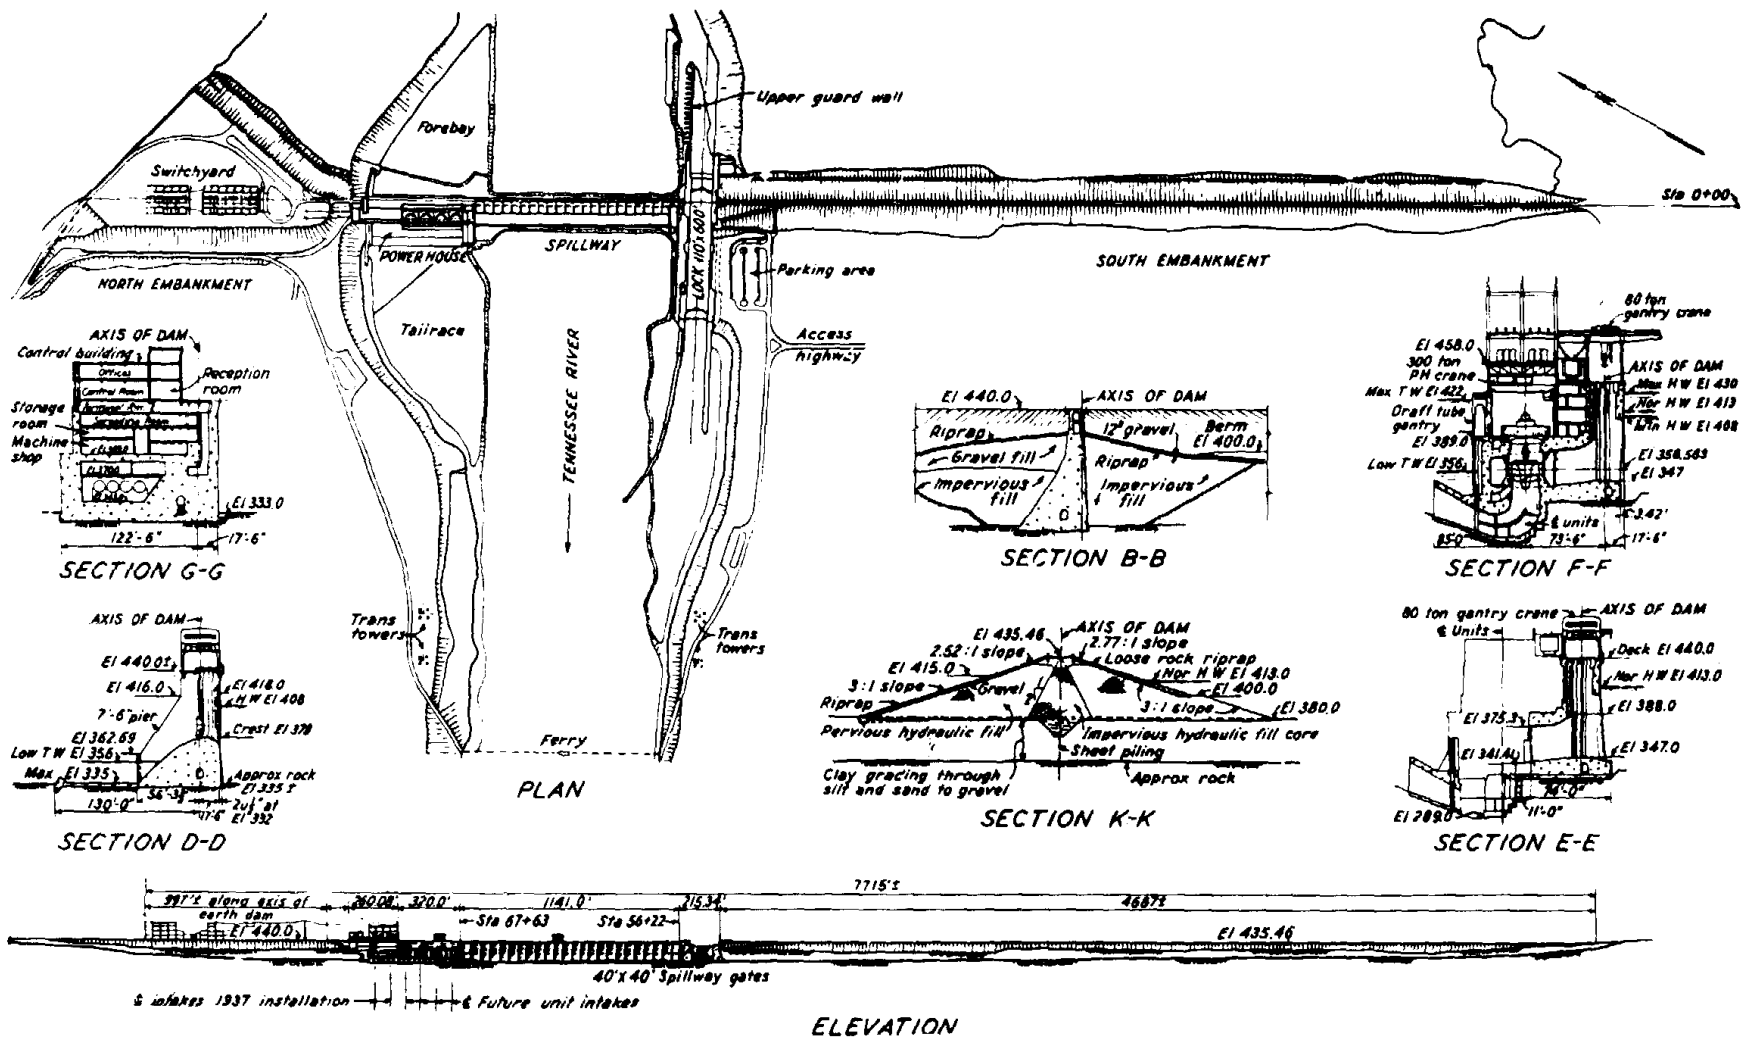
Plan, elevation, and sections of Pickwick Landing Dam.
